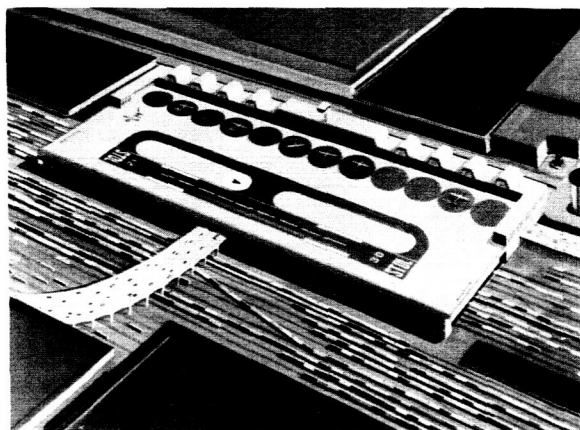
Elevated STOLport. Source: Ref. 9.
